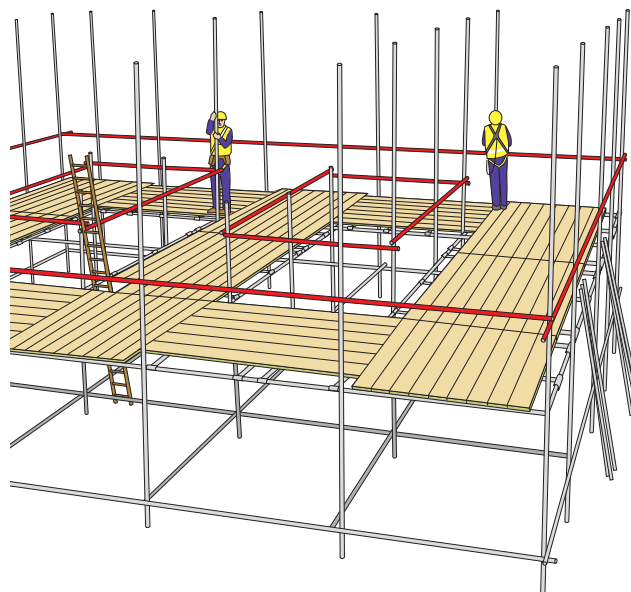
Example of a birdcage scaffolding system of work. Shows the scaffolders' safe zone used in runs for the erection of birdcage scaffolding. All bays can be reached to fix ledgers, transoms and braces without the requirement to fully board the entire structure.
